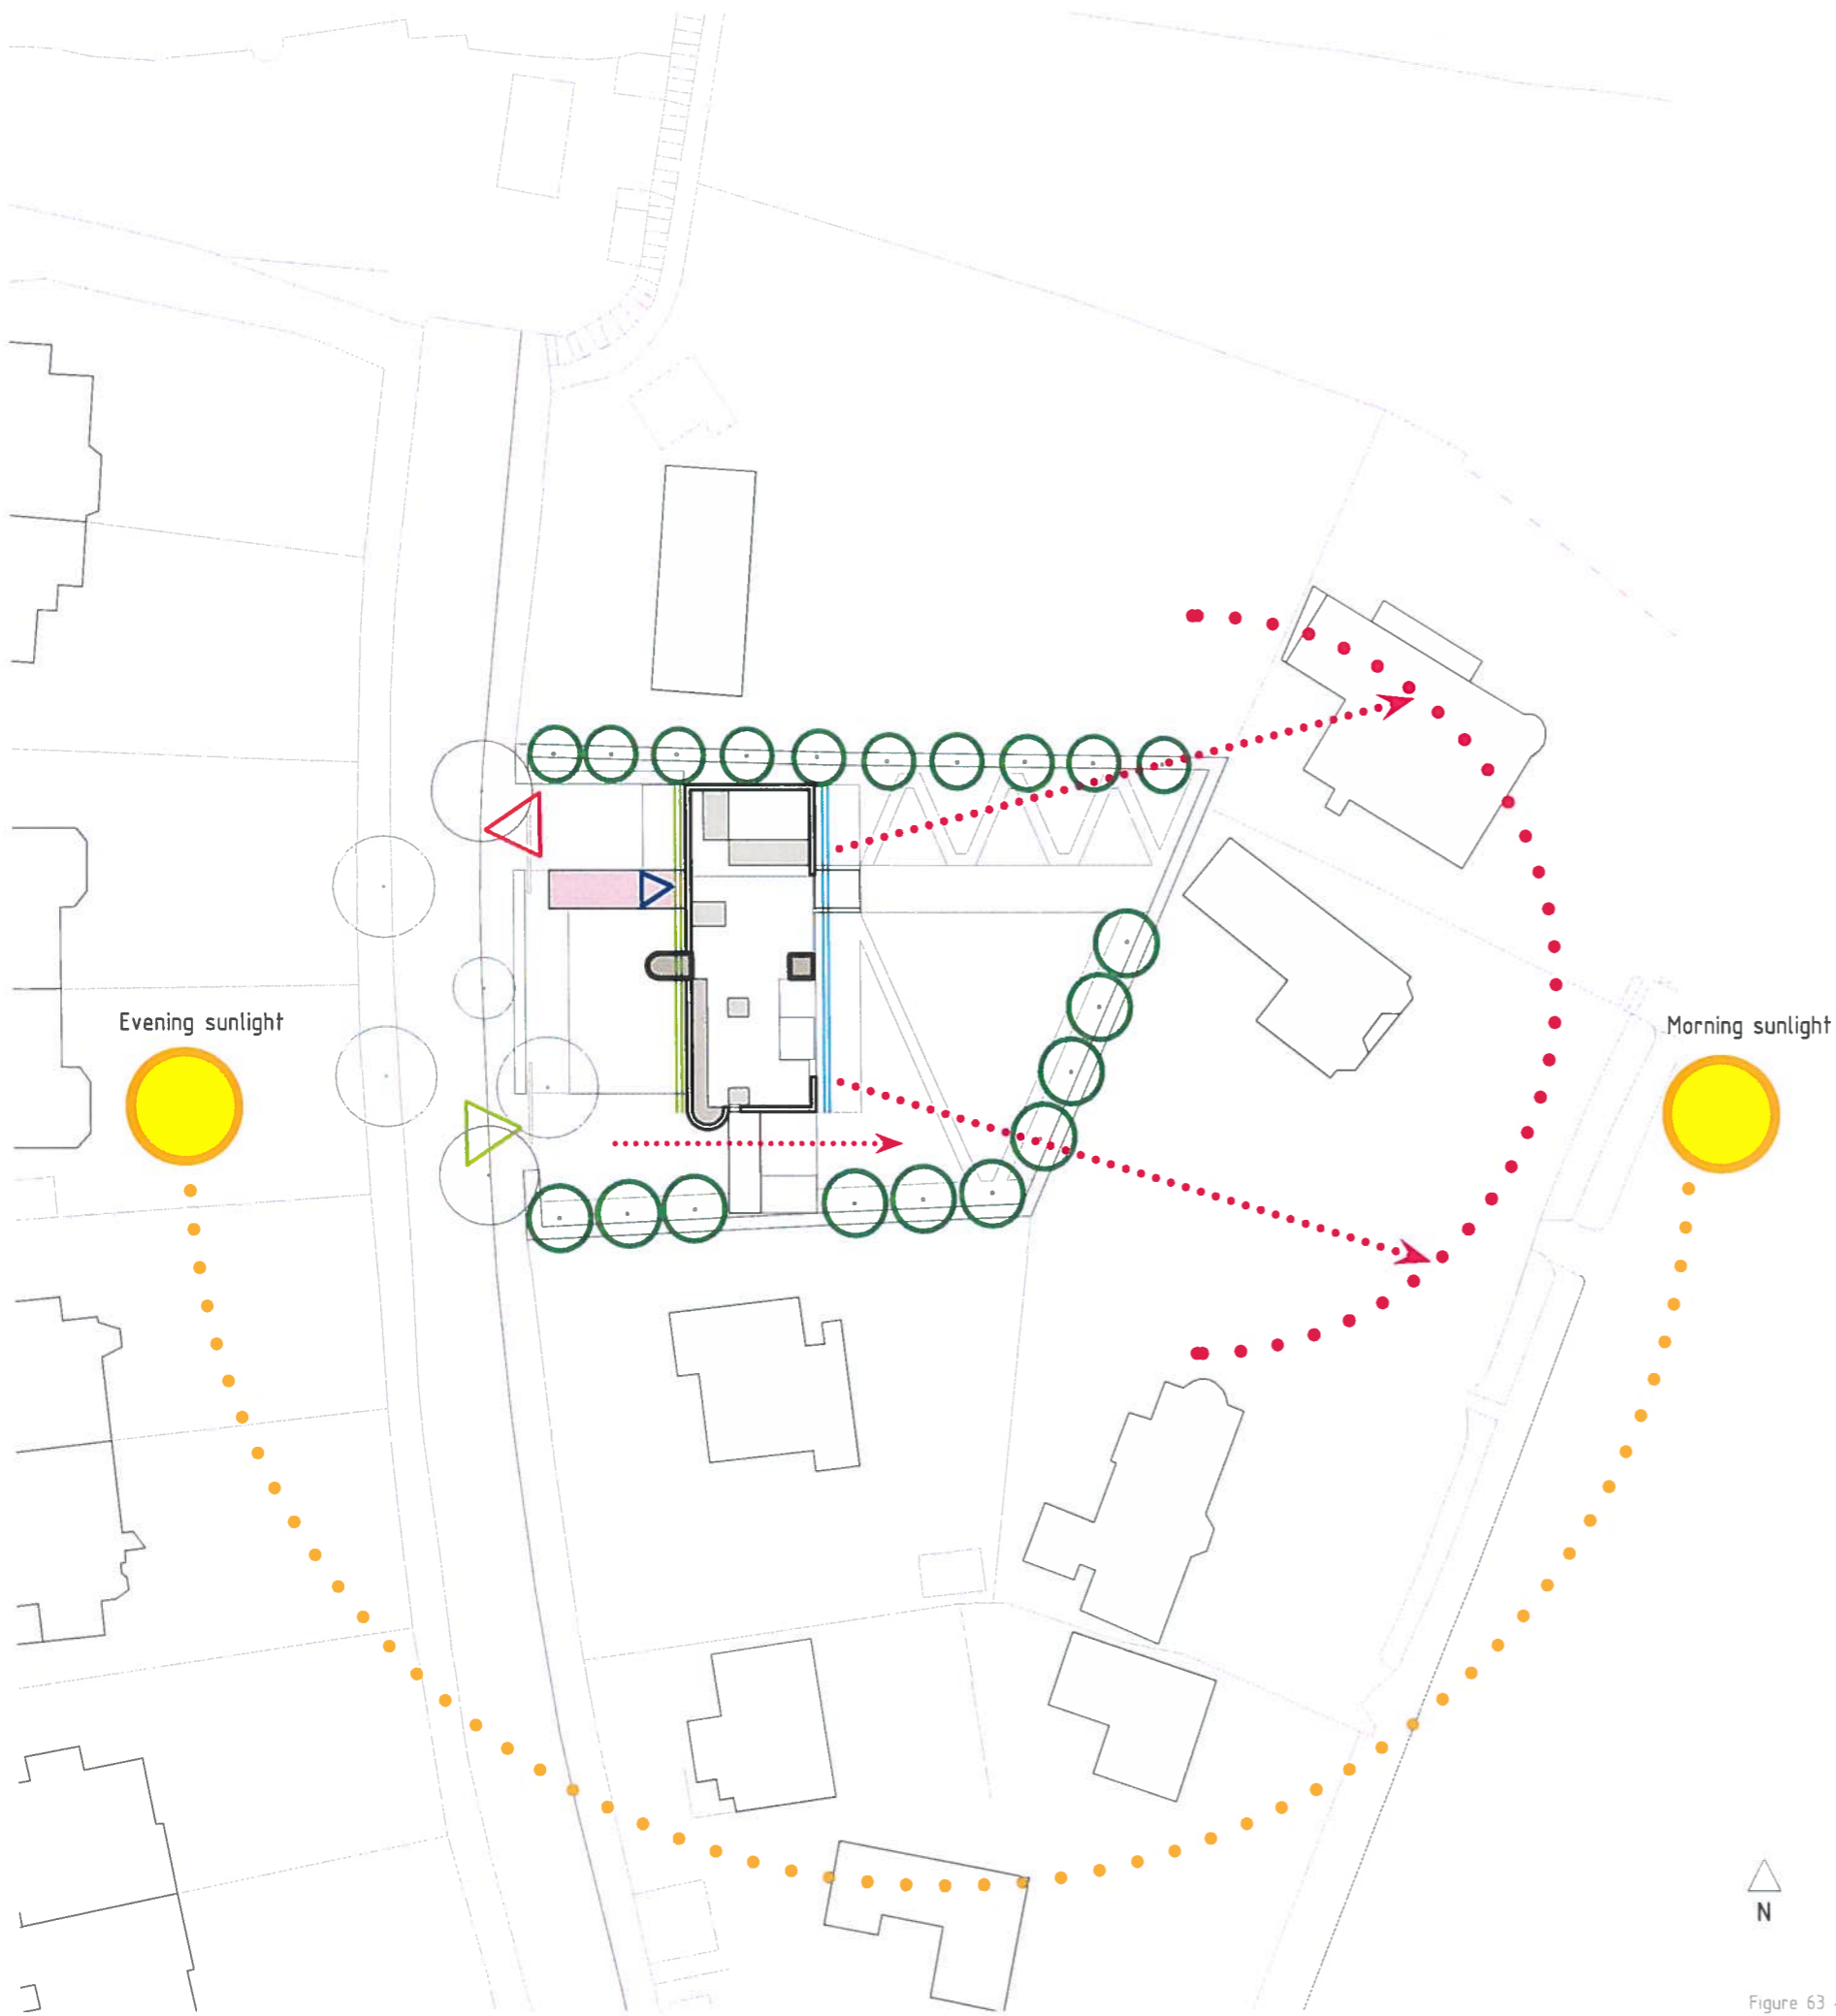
Design principles plan, showing the site massing, location and key attributes
